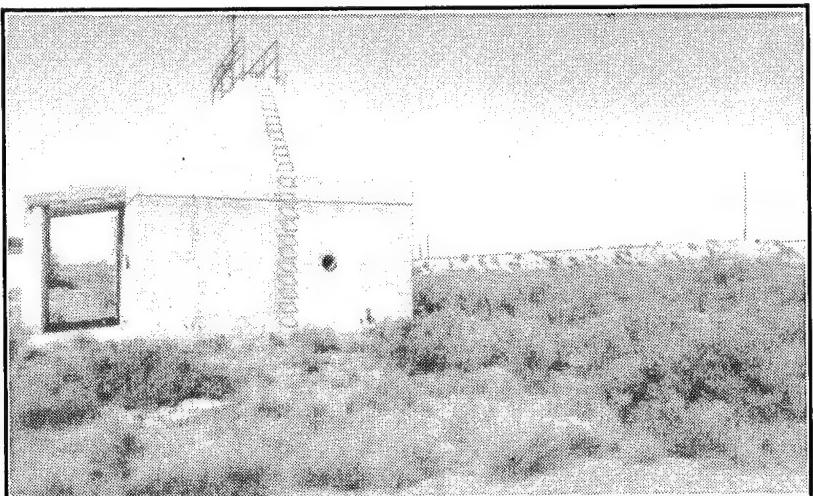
NATIV/JB-2 blockhouse, east elevation, illustrating manhole steps. JB-2 ramp in the background (Allred/Space Center 1994).
